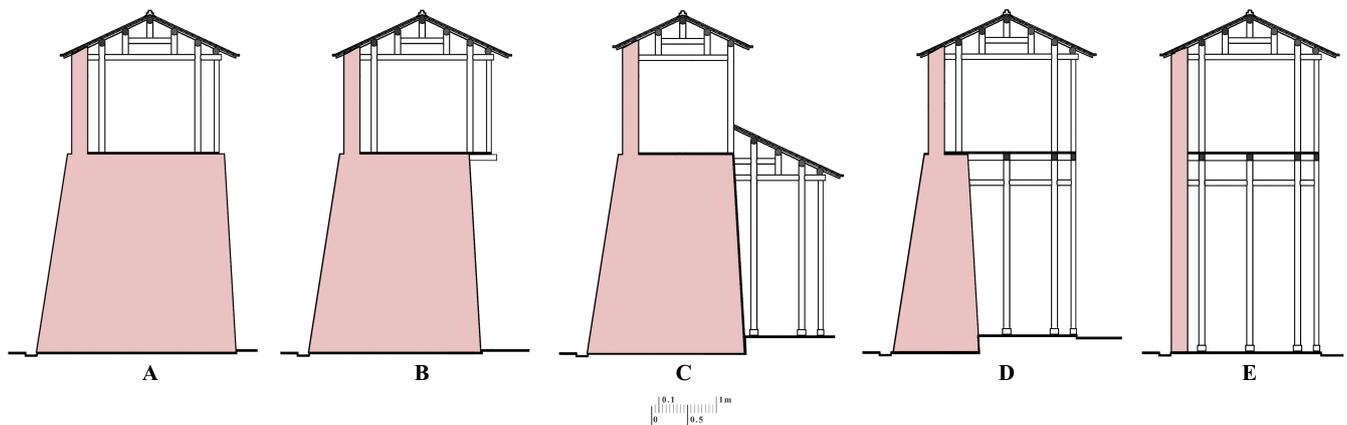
Building structural types of the outer fortress of Fujian Tubao. (A–C): independent wooden structures on the upper ring buildings and rammed earth walls on the bottom layer. (D): rammed earth walls on the bottom layer with wooden frameworks and independent wooden structures on the upper ring buildings. (E): independent wooden structures on the upper and lower ring buildings. This figure was drawn by the authors based on our field research and the content of the paper *Study on The Earth Fortress in Fujian. Master’s thesis* [60].
